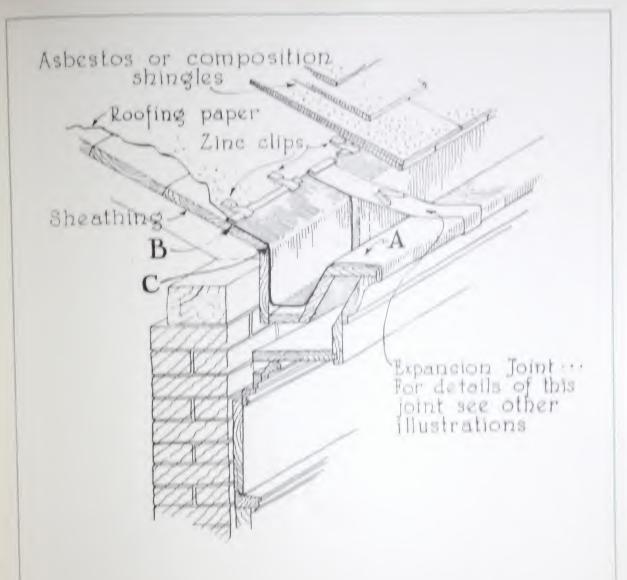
DETAIL ILLUSTRATING THE PROPER METHOD OF FORMING ZINC SHEETS IN GUTTER ENDS AND SIDES USING WOODEN FILLETS TO AVOID SHARP ANGLES
